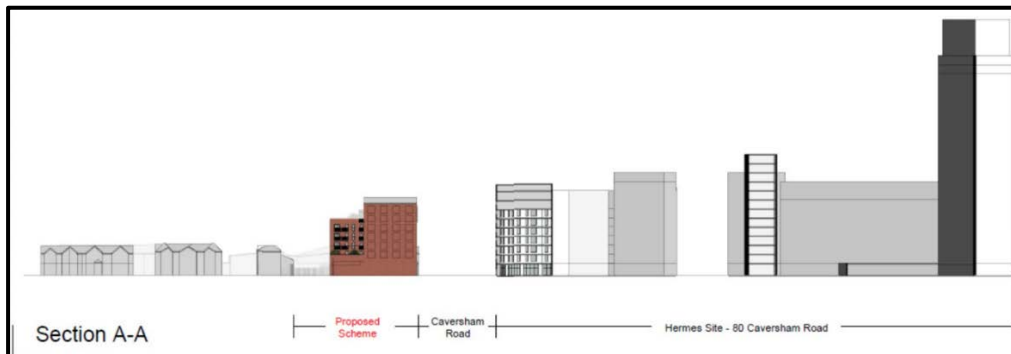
Section of comparable building heights (Approved 80 Caversham Road)
